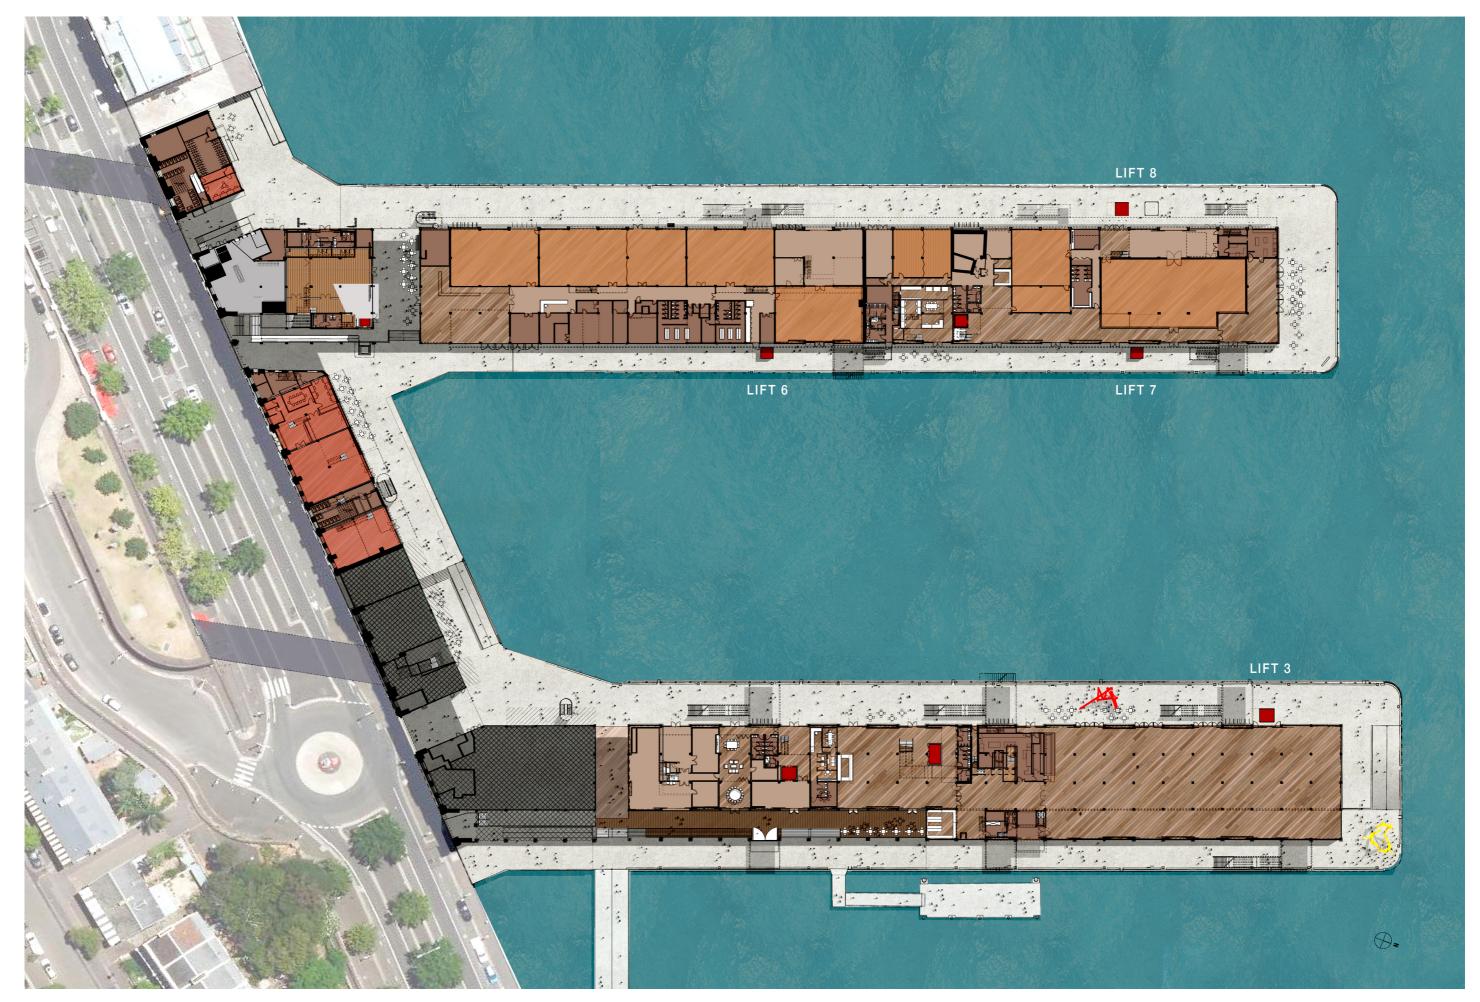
Ground floor plan showing lift locations Source: Tonkin Zulaikha Greer Architects
